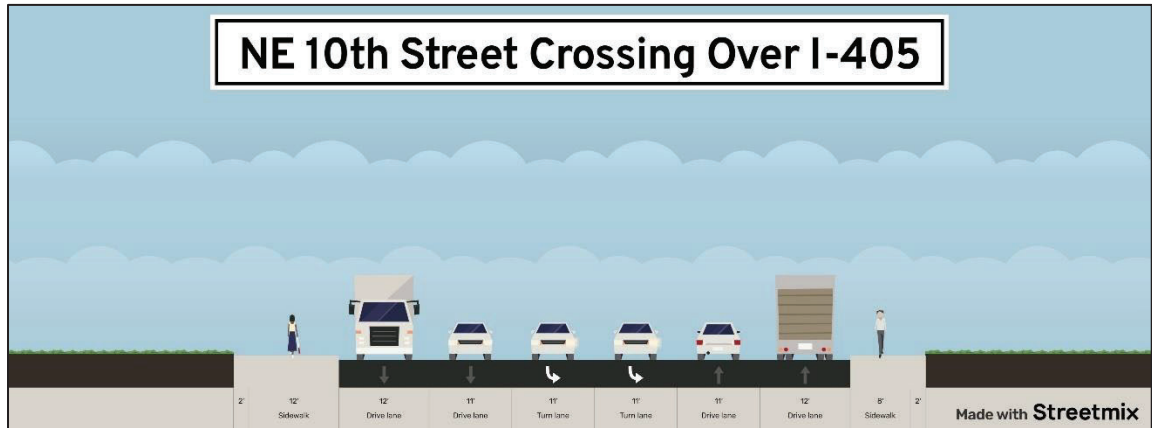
Existing NE 10<sup>th</sup> Street Cross-Section for the Crossing Over I-405 (facing west)
